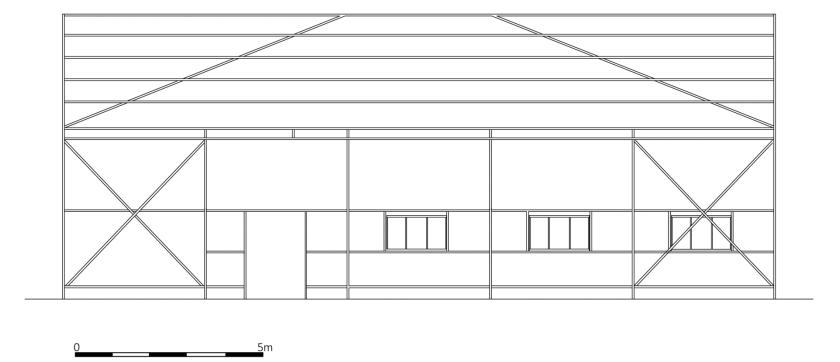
Robin Hangar north and south elevations (scale 1:100)
